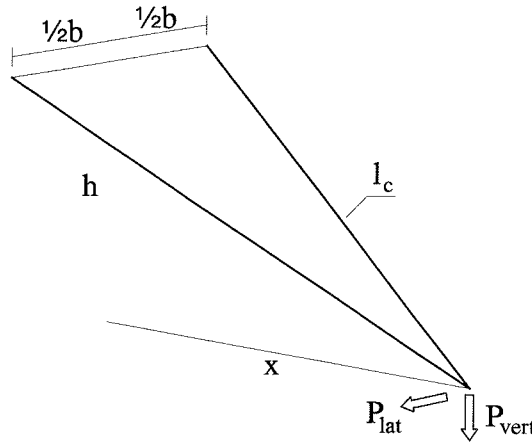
Spatial system with two cable planes anchored at the girder axis.
